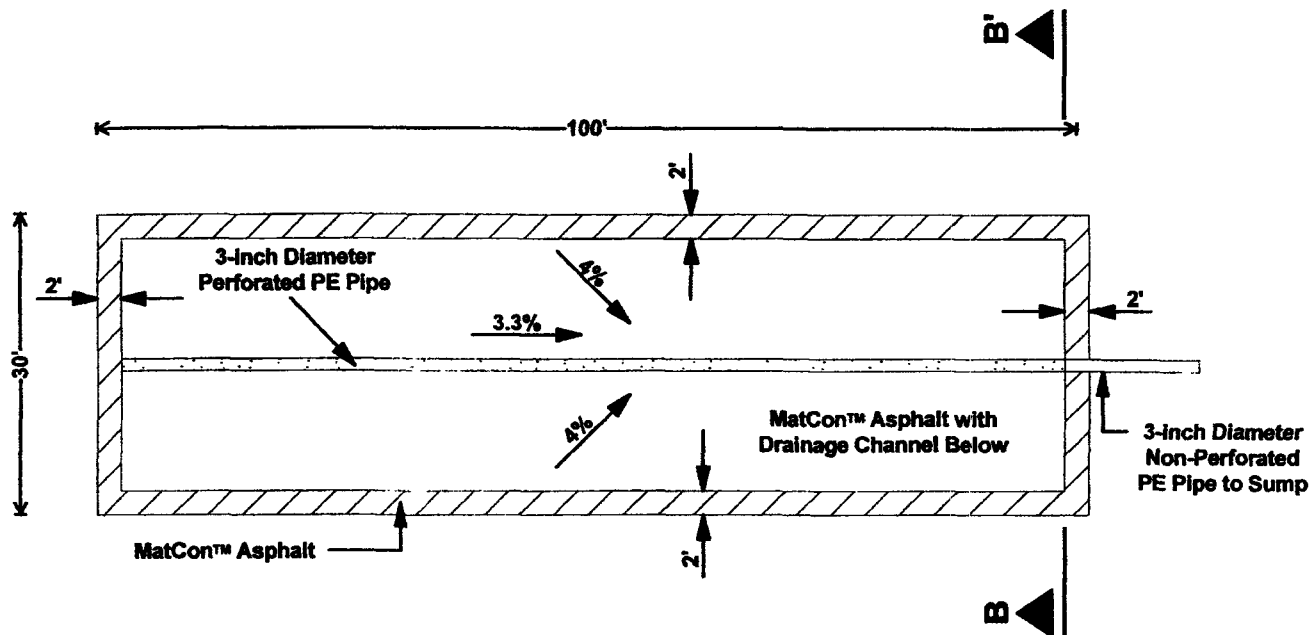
Plan view of the test section of the cover system at Tri-County Landfill.
